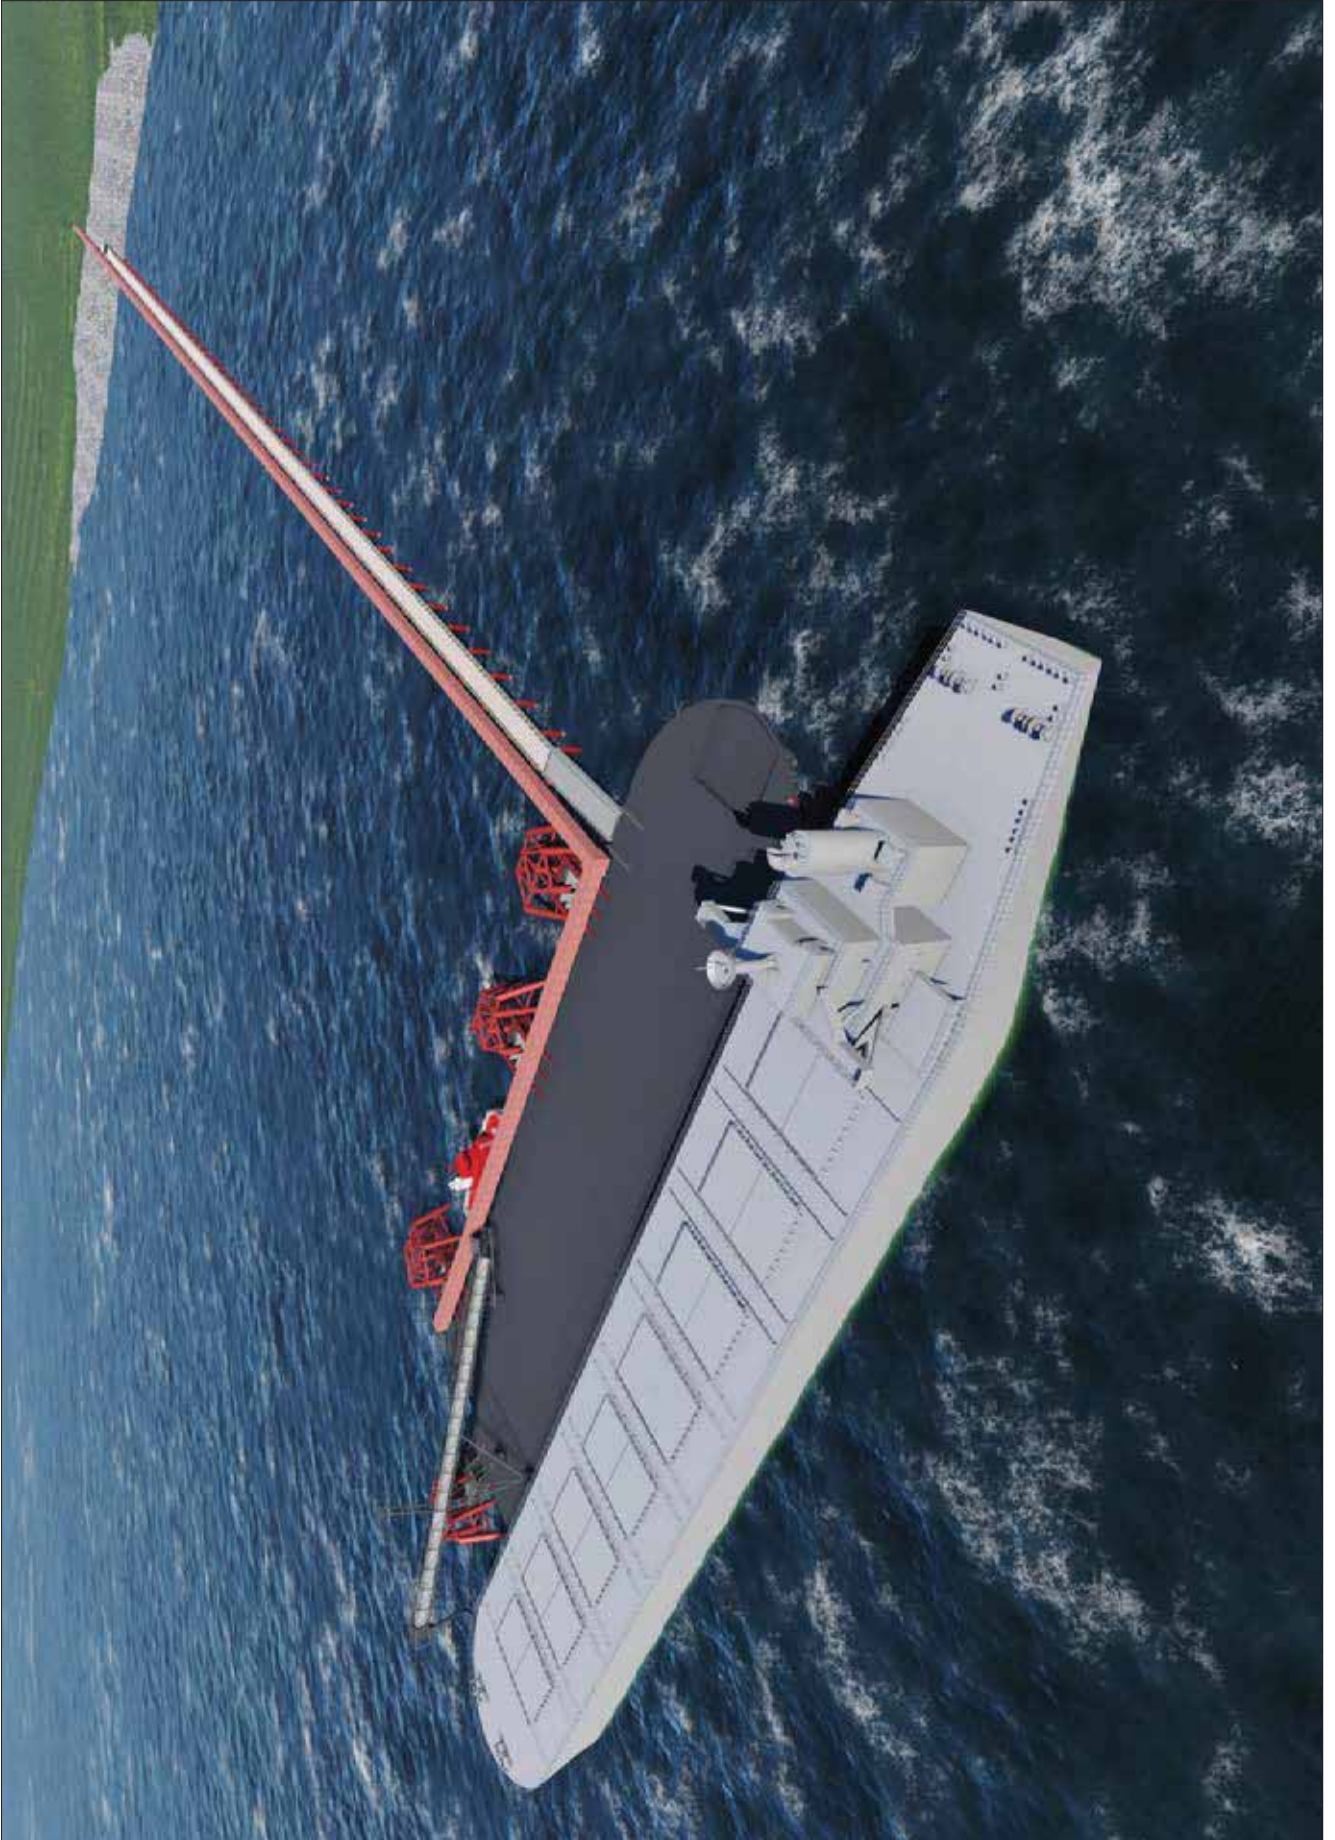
REVISED DESIGN – 3D RENDER SHOWS THE SUSPENDED DECK, LINKSPAN BRIDGE, PONTOON AND SHIP
